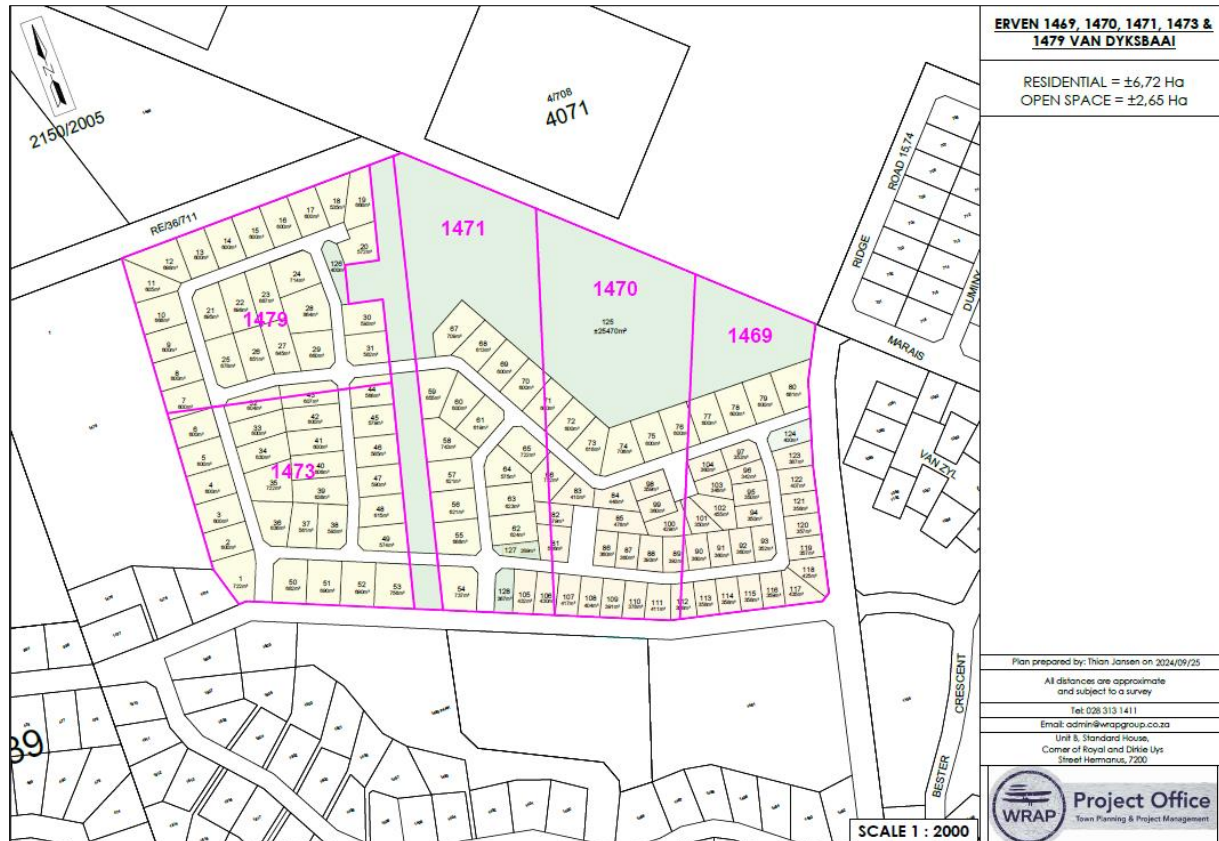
Proposed Site Development Plan for Erven 1469, 1470, 1471, 1473 & 1479 Van Dyksbaai
